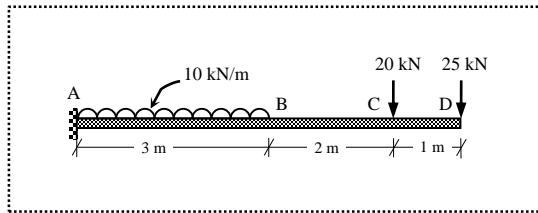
Cantilever beam with multiple loads (Example 2.23)
